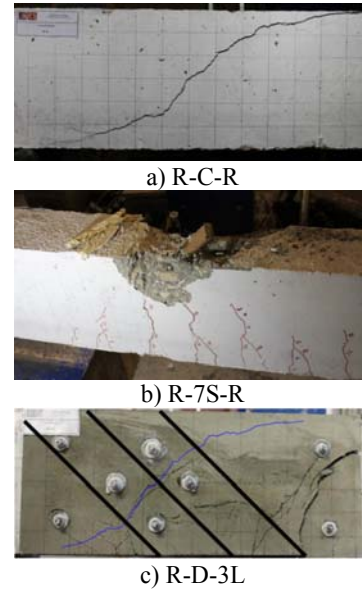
Crack pattern at failure load of the rectangular cross section beams
